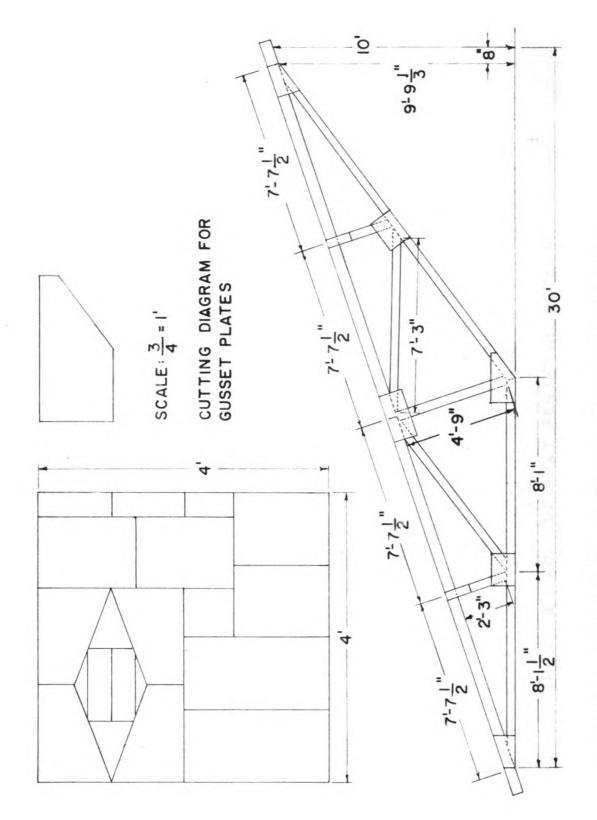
TRUSS "A" - GLUE-NAIL FASTENING DETAILS
